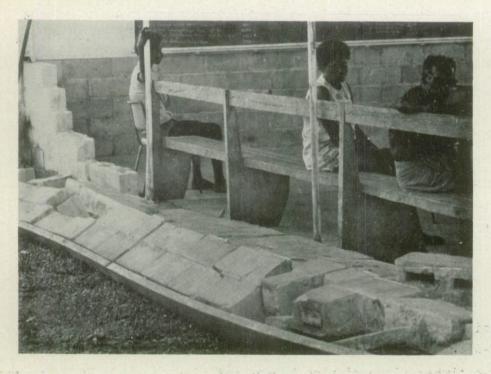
Collapsed concrete besser-block wall, council building, Bana. Note that ties were made to the vertical pipe columns.
